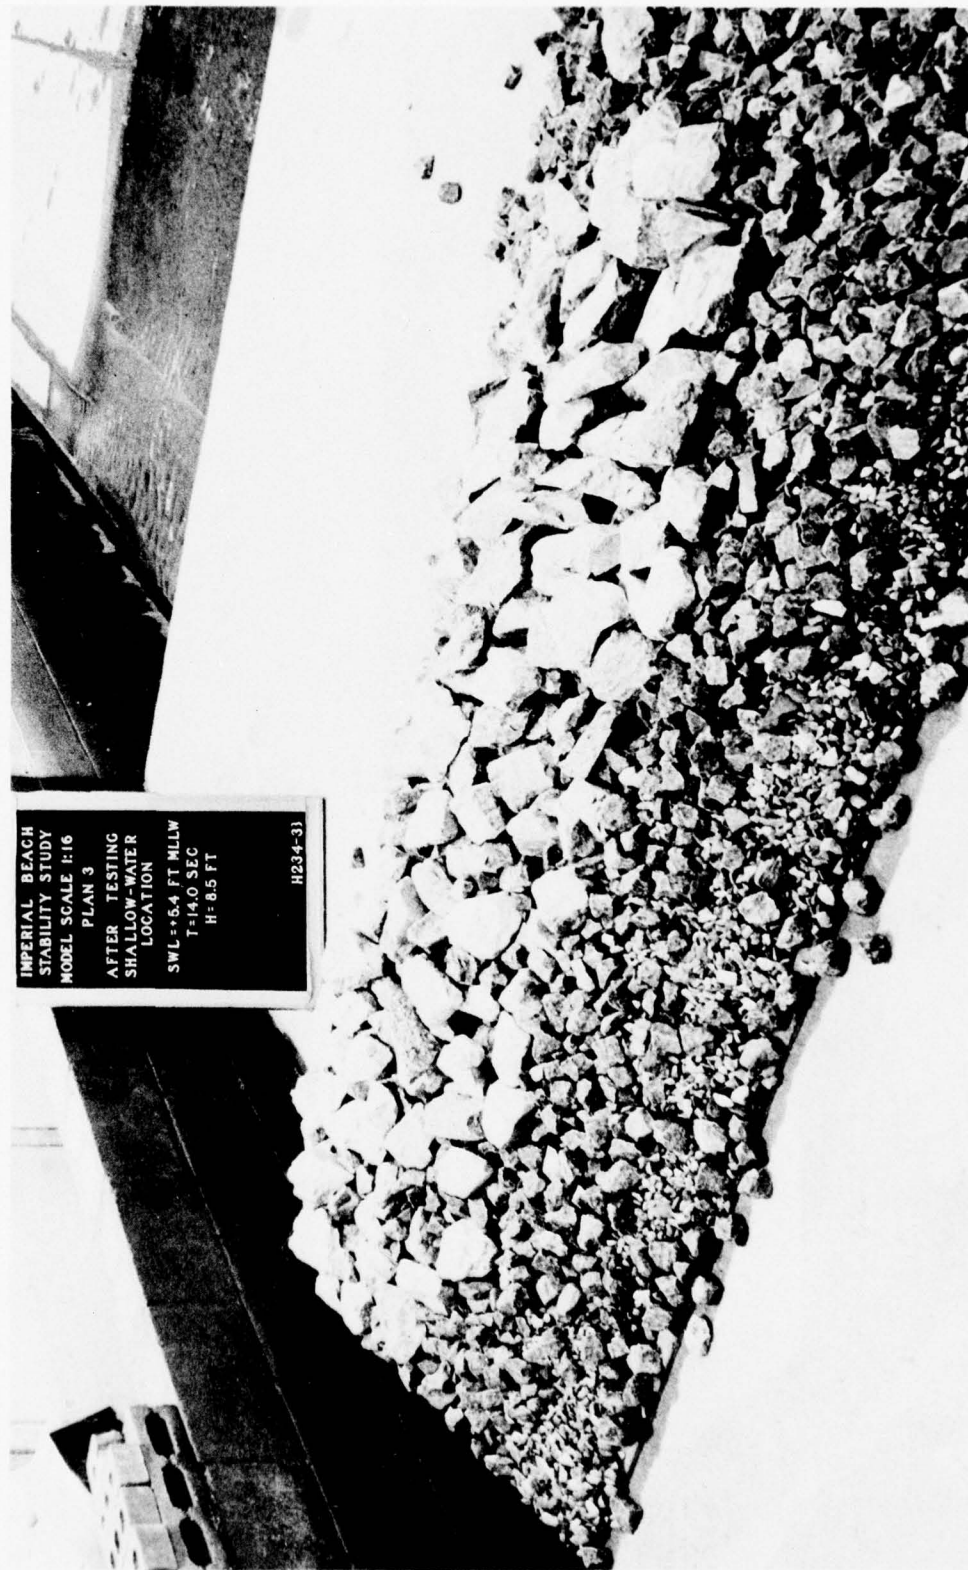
Sea-side view of high-sill section of Plan 3 in the shallow-water location after 2.0 hr of 14.0-sec, 8.5-ft waves at an swl of +5.4 ft mllw
